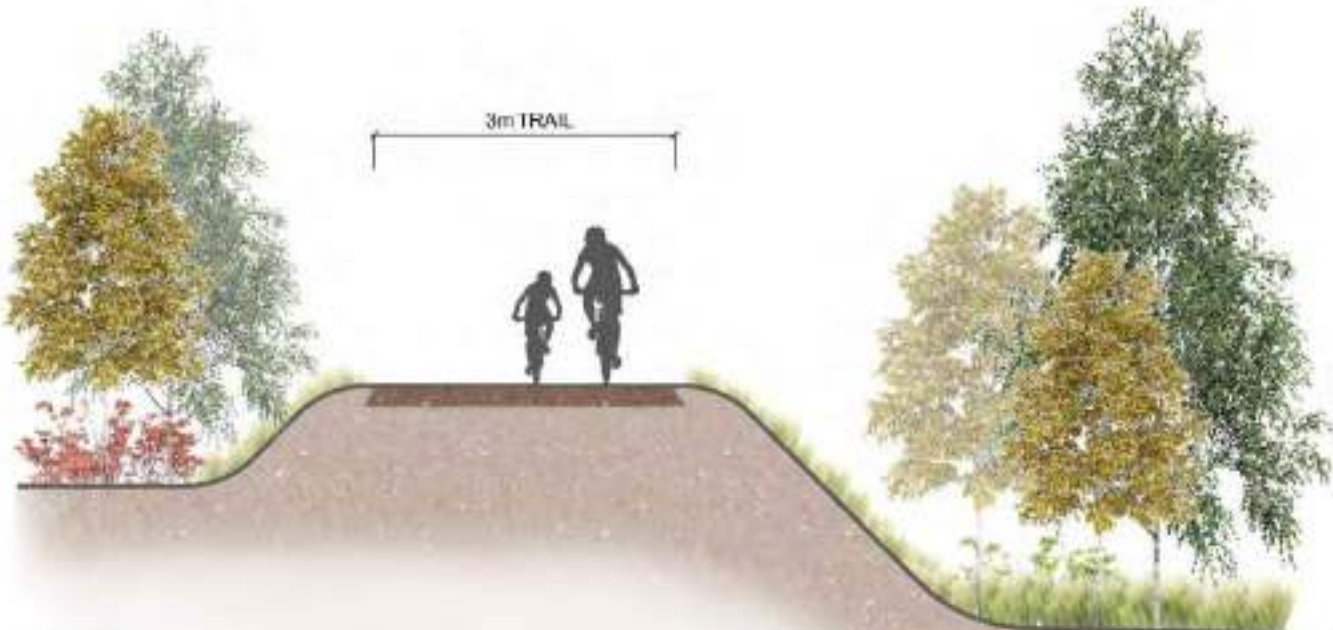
Proposed trail condition - where relevant with minimal intervention.
